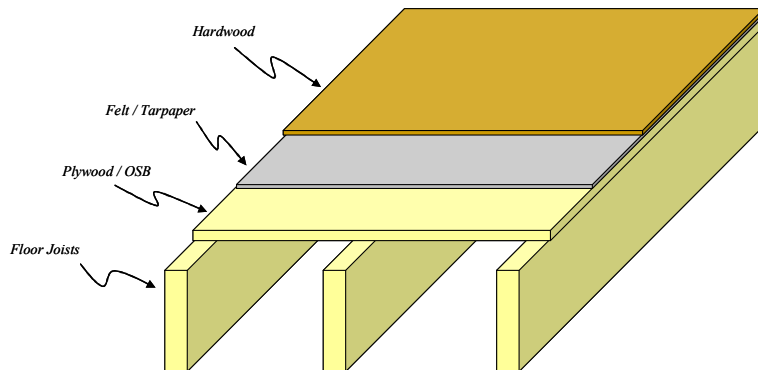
(c): Hardwood flooring with felt/tarpaper on wood frame construction.
